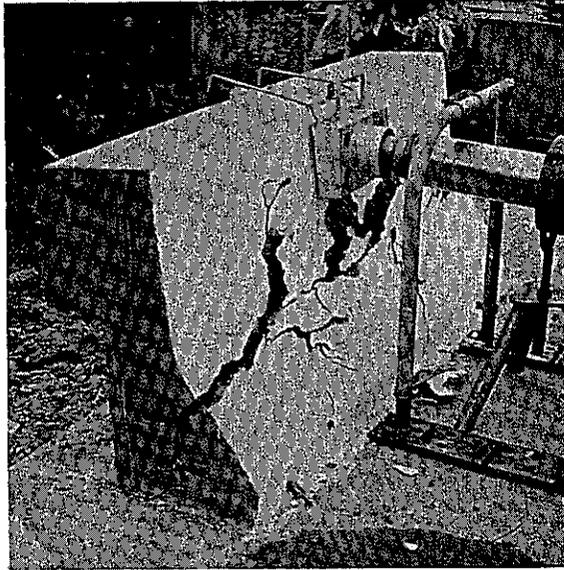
Oblique view of the 6 1/2-foot long standard Type 25 Concrete Bridge Barrier section after horizontal load test in Series III, Test Number 2.
